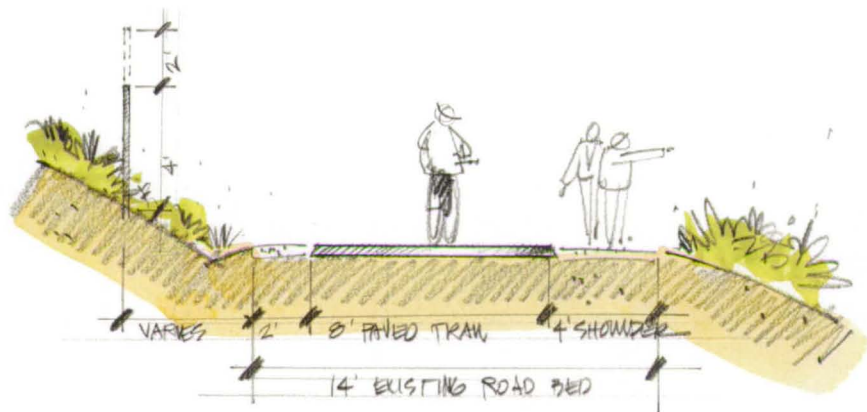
Paved Multi-Use Trail in Landfill on 14' Road Bed
